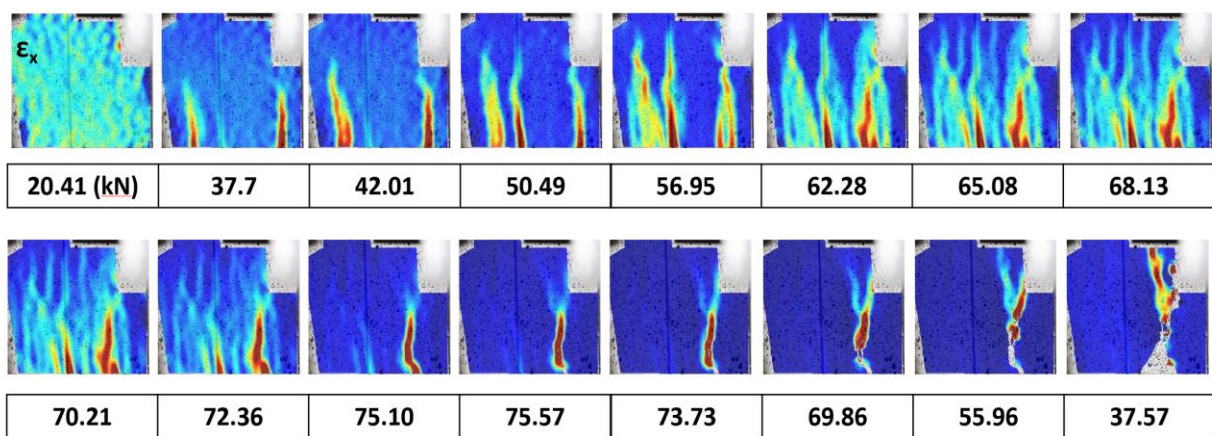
Crack development in flexural specimen (P2, Batch 1)
